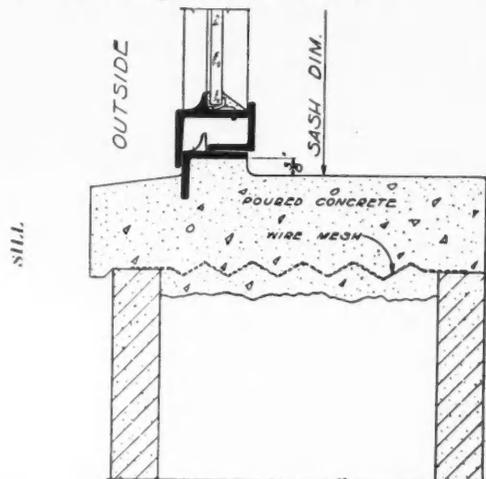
Detail of Sill Construction, Showing Poured Concrete Sill in Connection with Concrete Blocks and Steel Sash.
